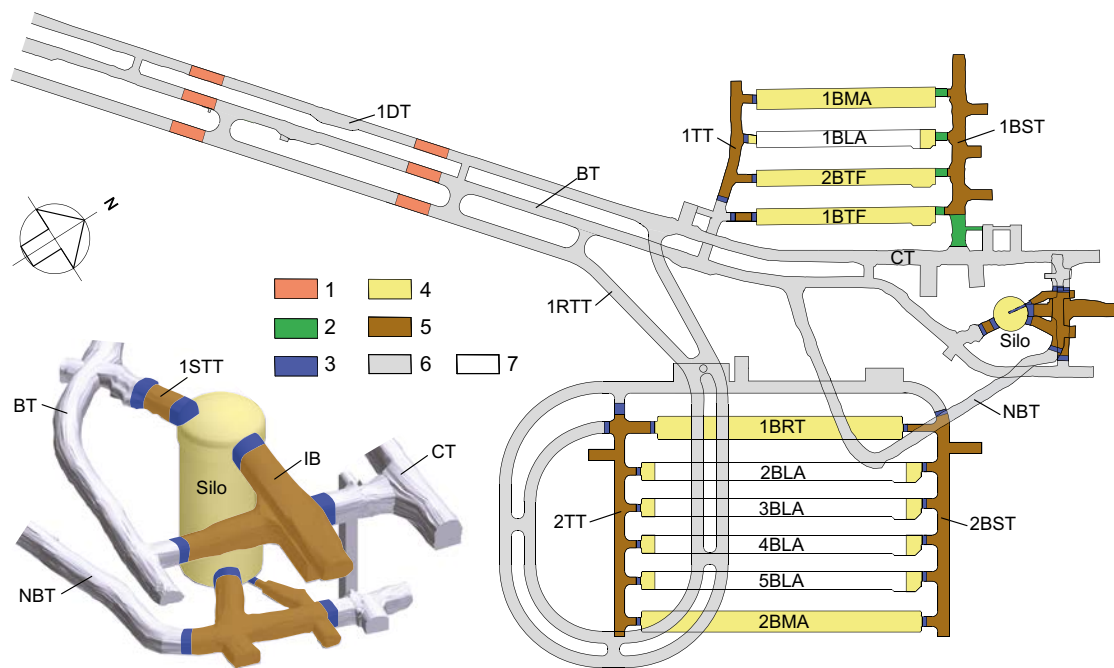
Overview of SFR after closure with detailed view of the silo. Key to numbering: 1) Plugs in access tunnels 2) Transition material 3) Mechanical plug of concrete 4) Backfill material of macadam 5) Hydraulically tight section of bentonite 6) Backfill material in access tunnels and tunnel system 7) Non-backfilled openings. Note that the figure shows Layout 2.0; Layout 1.5 is used in SR-PSU modelling. The difference that can be seen in the figure is that BRT is longer than in Layout 1.5.
